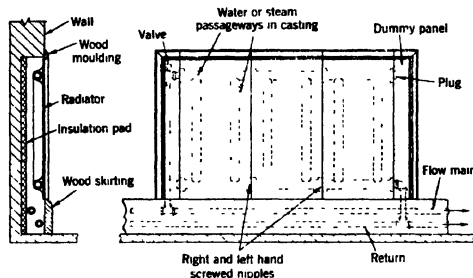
FLAT TYPE PANEL INSTALLED IN WALL RECESS
